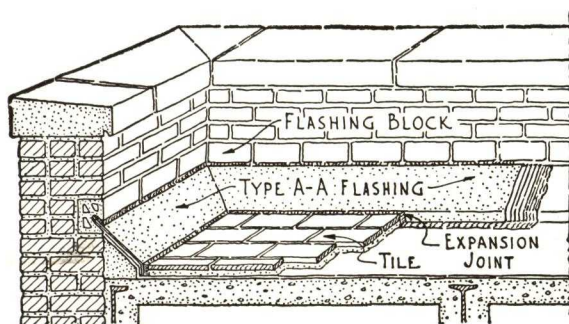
DETAILS FOR INSTALLING FLASHING IN CONNECTION WITH PROMENADE TILE ROOFS
